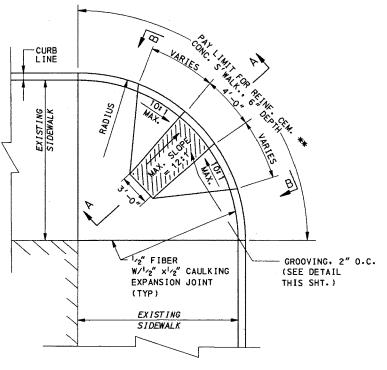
DETAIL-TYPICAL GROOVING AT SIDEWALK RAMPS NO SCALE
